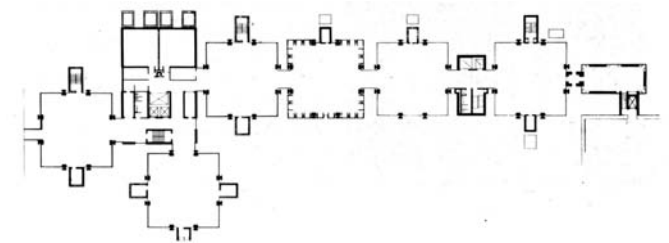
Richards Medical Building -plan of extended building; the three stacks on the right are later additions.
